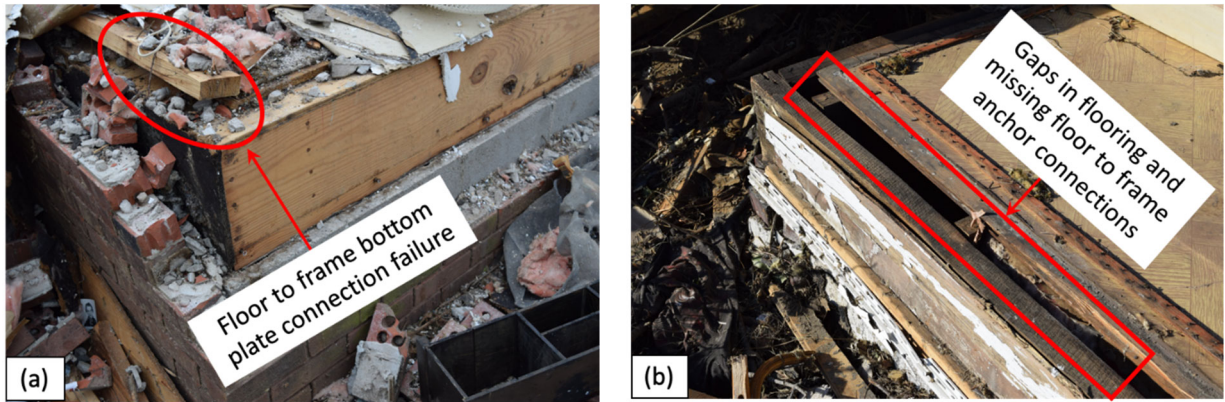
Common wall-to-foundation connection failures; (a) removal of the bottom plate from subfloor and wall studs from bottom plate in a Princeton home due to reliance on nailed connections in withdrawal; (b) removal of the bottom plate and stud walls from the wood-frame floor platform in a downtown Mayfield home due to reliance on nailed connections. (Images acquired by the FAST).
